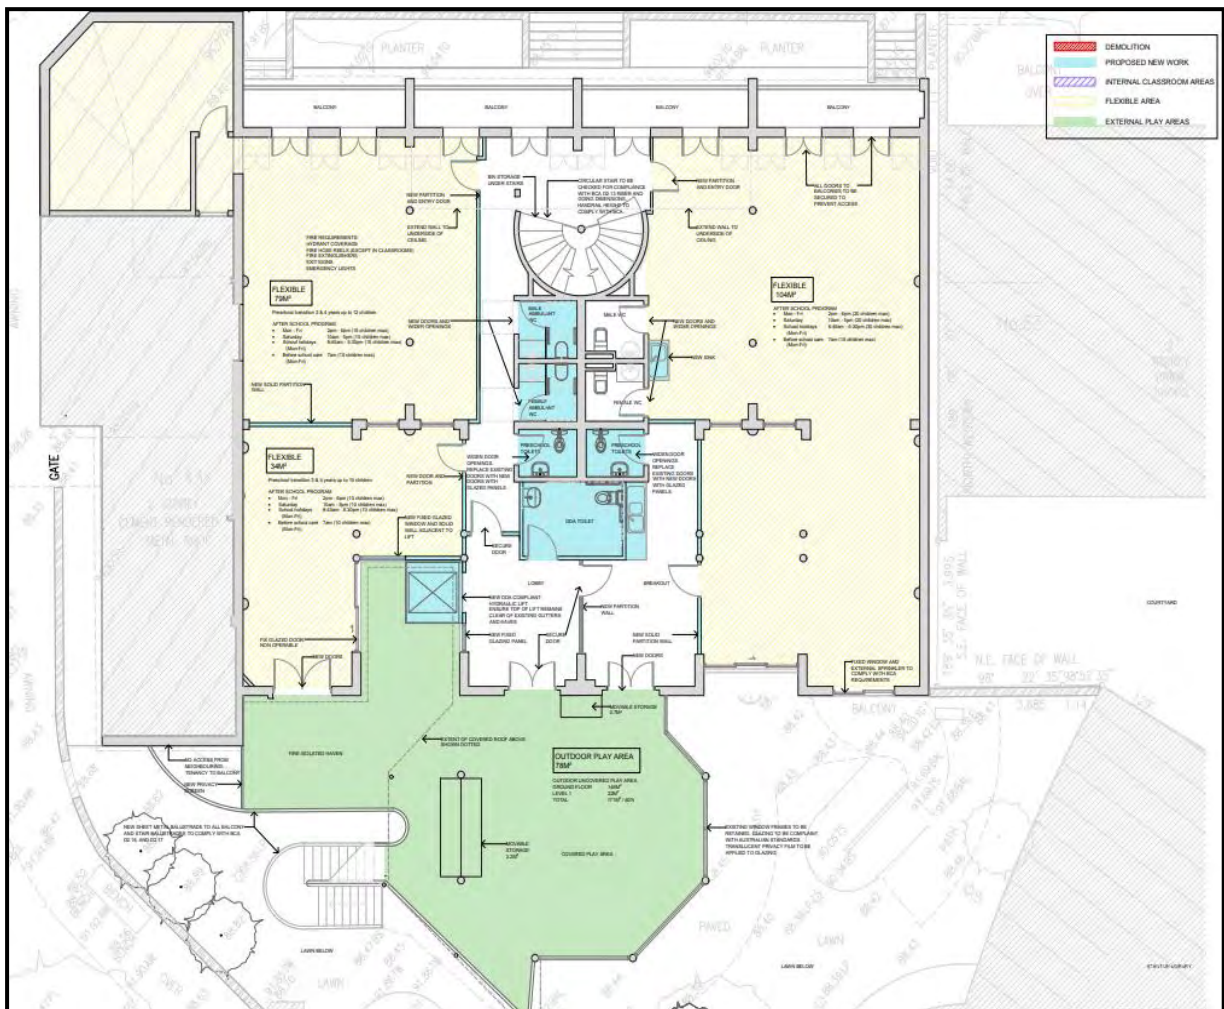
Proposed Amended First Floor Plan (Extract from Architectural Plan DA. 201 – Lucy Jackson Architect)
